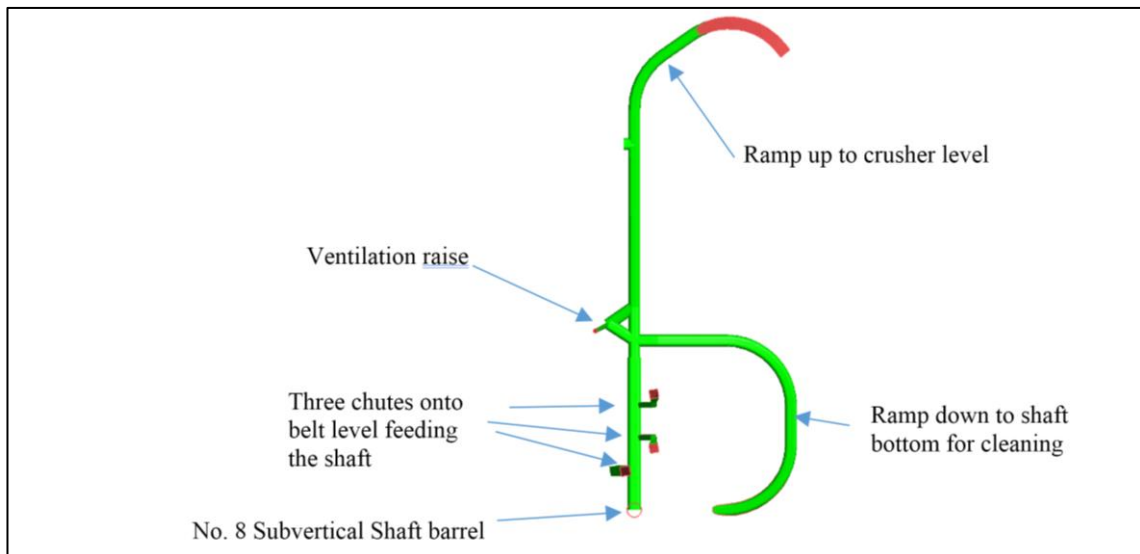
Plan view of 3460L showing the positions of the No. 8 subvertical shaft, belt level and access ramps
